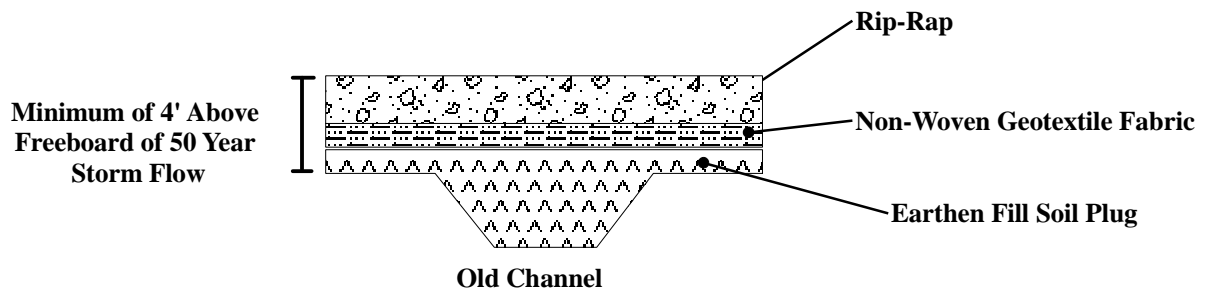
of 16. Stream Relocation Plan View and Cross Section For the Bovill Project, Bovill, Idaho. Permit # NWW-2006-640-CO1
